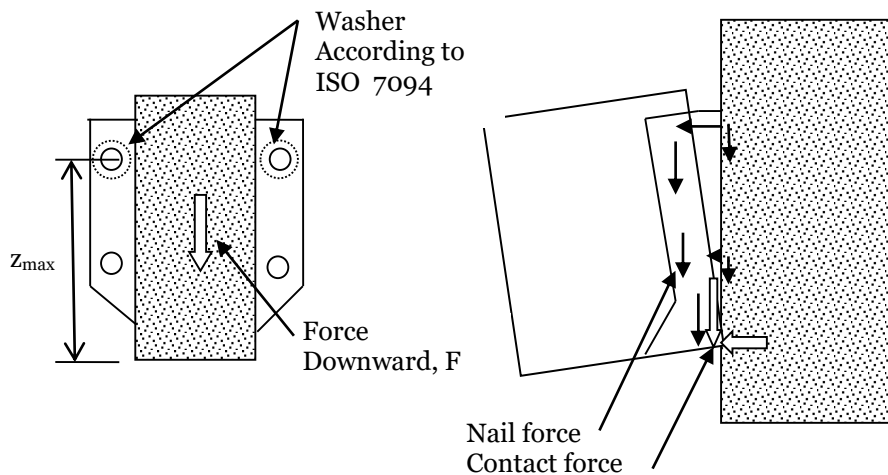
Left: Cross section in joist. Right: The joist will deflect and rotate, at the bottom a contact force will occur at the bottom plate, and the withdrawal forces in the bolts in the wall will vary linearly as assumed for nailed connections in the header.
